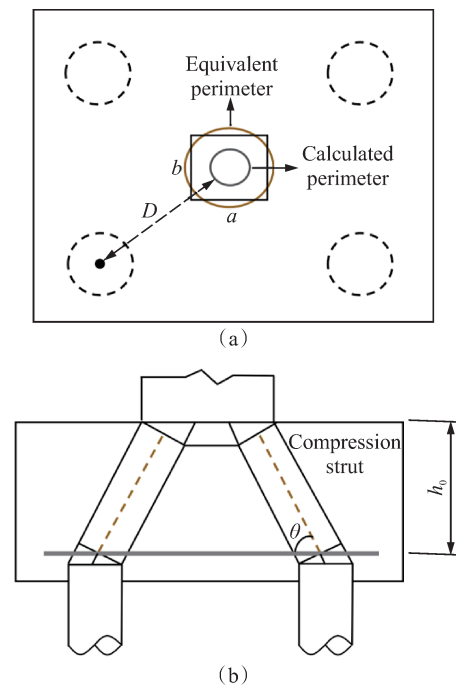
Span-to-depth ratio and inclination angle of the diagonal strut of the pile cap. (a) Pile cap plan view; (b) Pile cap elevation view
